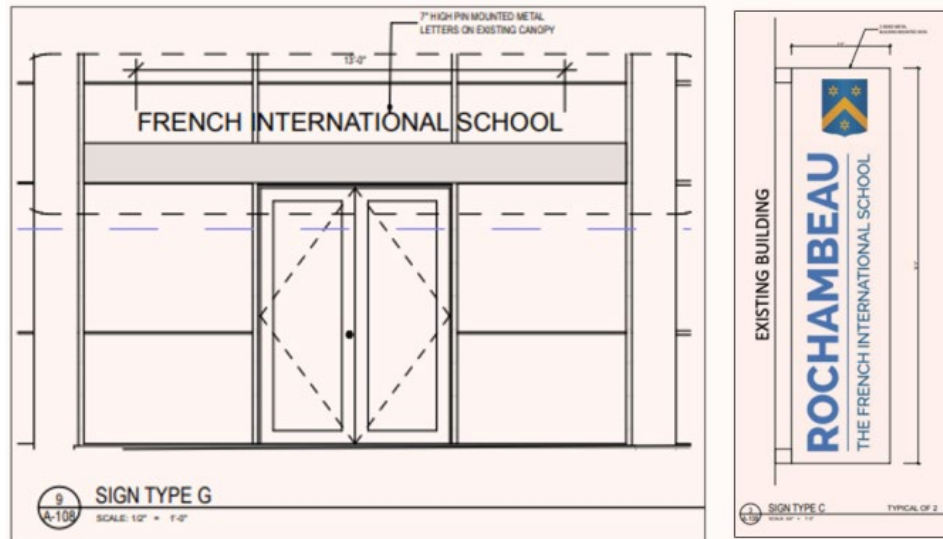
Sign Details: Building Signs – Type G (Left) and C (Right)
